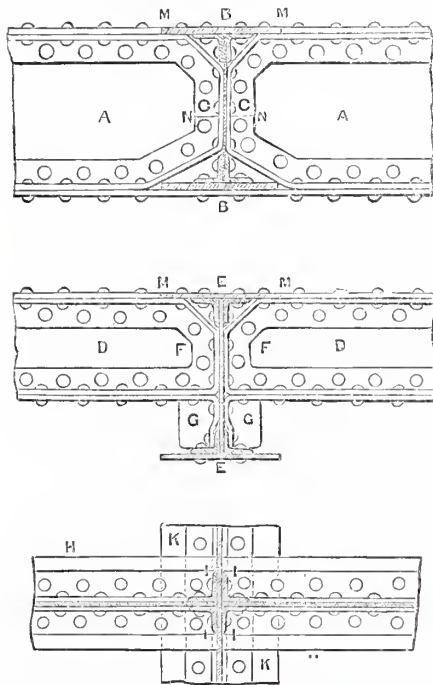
Connection of Longitudinal Girder with Cross Girder.
